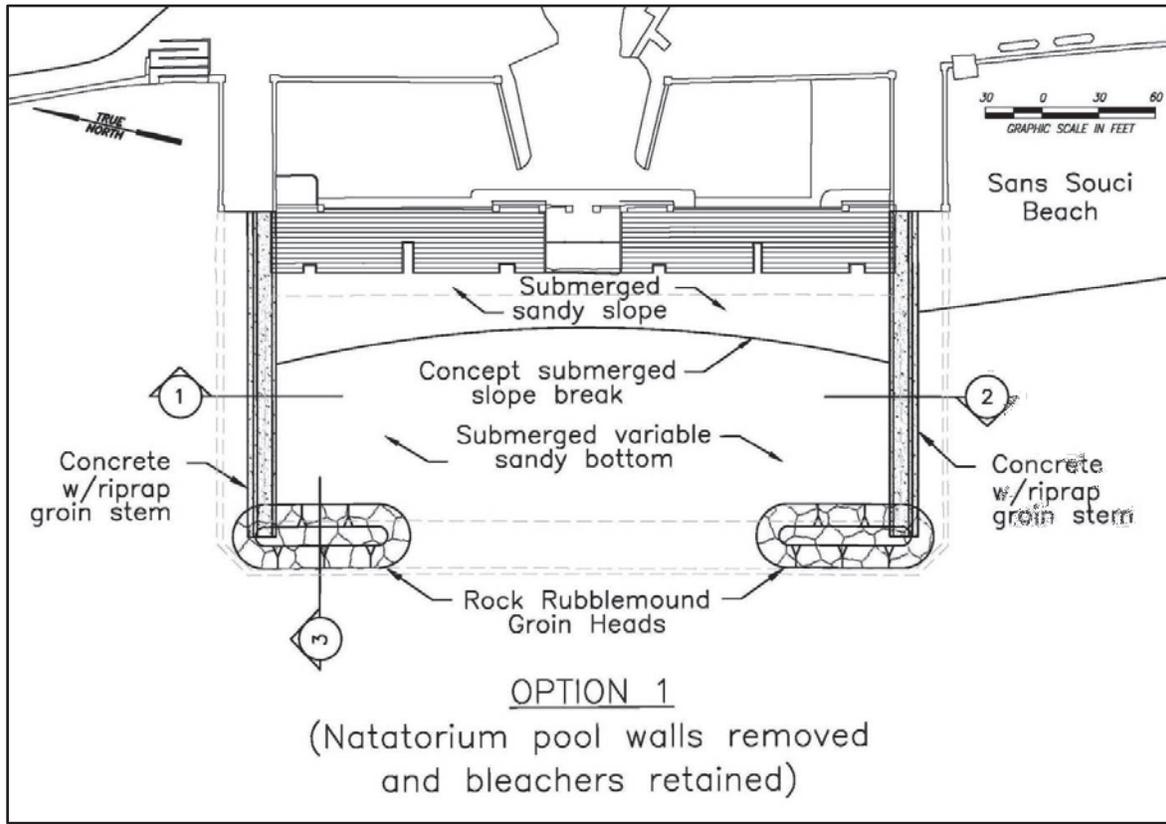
Plan view – Option 1 with pool walls removed and bleachers retained.
